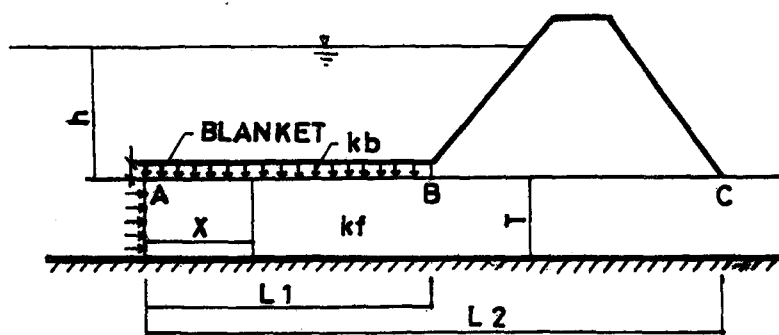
Schematic of A Rectangular Blanket of Dam on Pervious Foundation (Garde and Raju ,1980).
